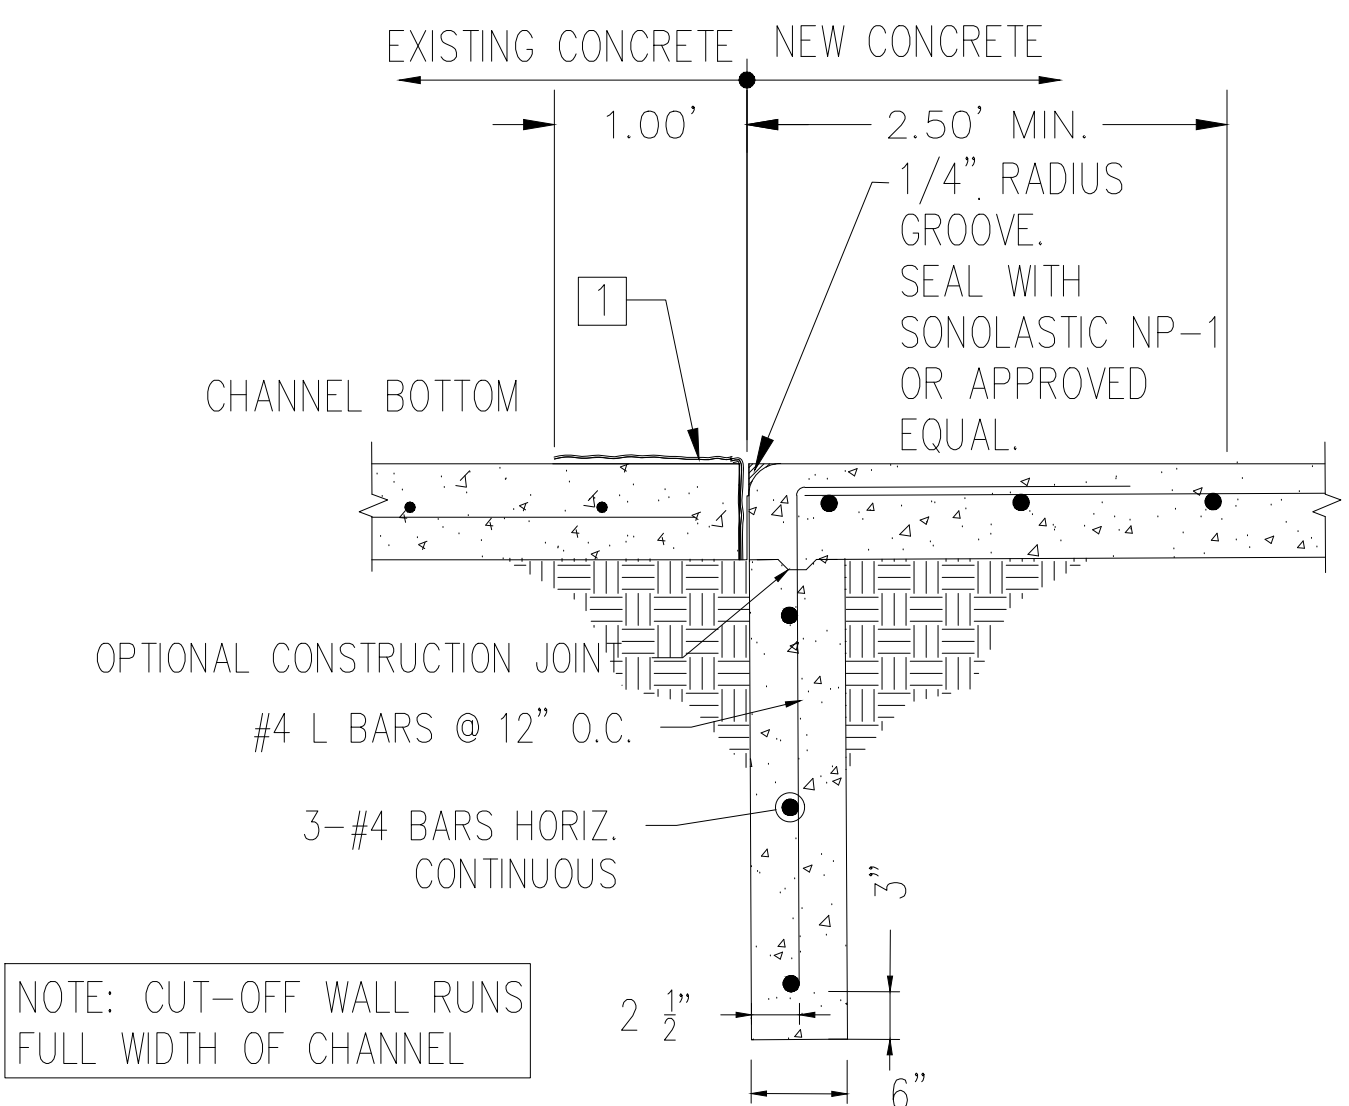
DETAIL D: TYPICAL TRANSVERSE CONSTRUCTION JOINT
